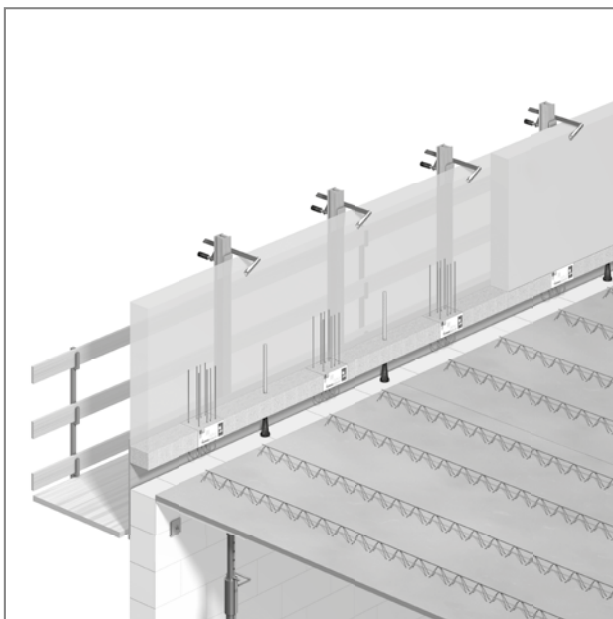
Schöck Isokorb® XT type A with Combar® FT erection support: Securing of the aligned precast concrete parapet
